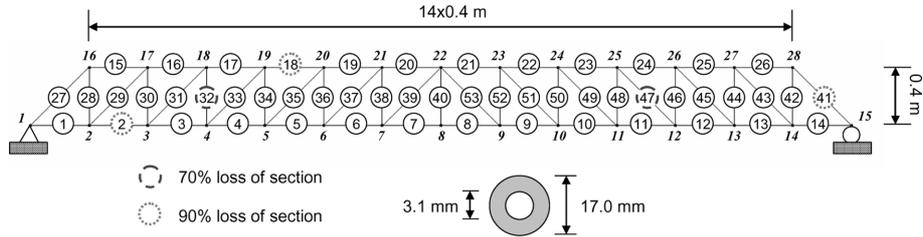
Fourteen-bay planar truss structures and damage scenario
